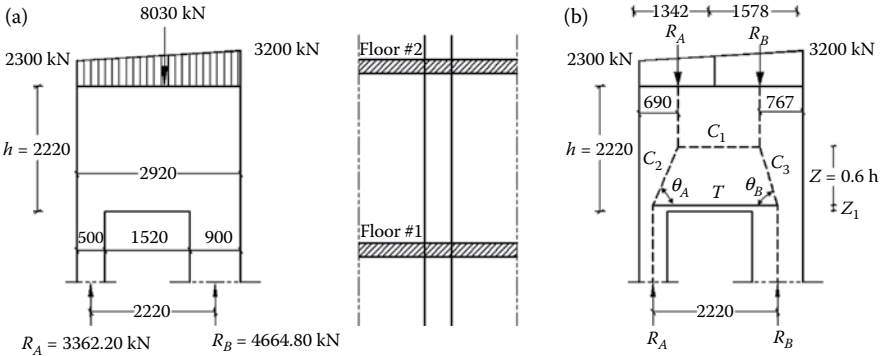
Example 5.2—Wall-type column: (a) elevation and (b) STM.
